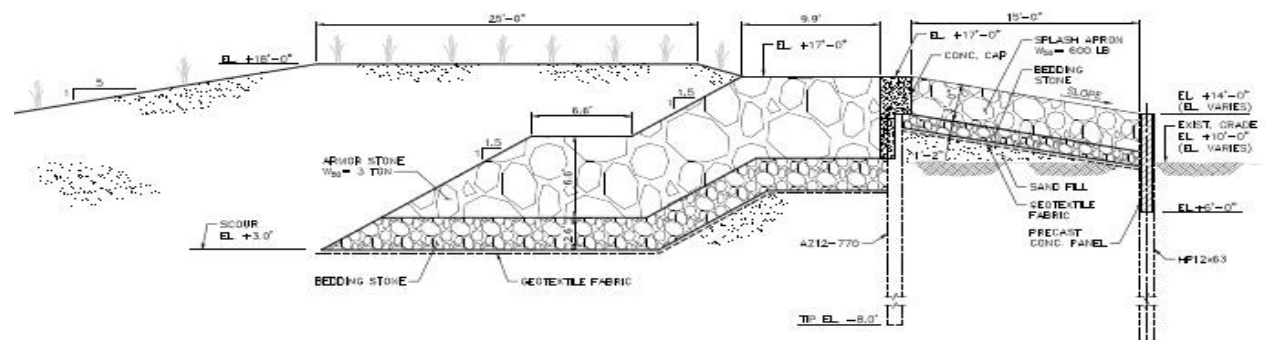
Composite Seawall Beach 126th Street to Beach 149th Street.
